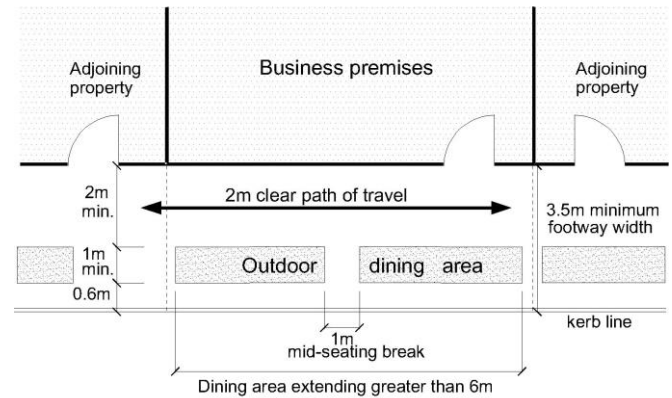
; general layout for Outdoor dining areas located adjacent to the kerb
